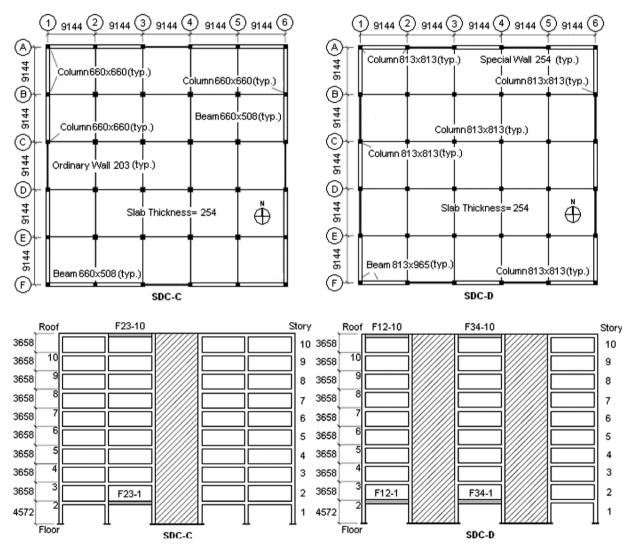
Plan and elevation of building SDC-C and SDC-D (Unit: mm).
